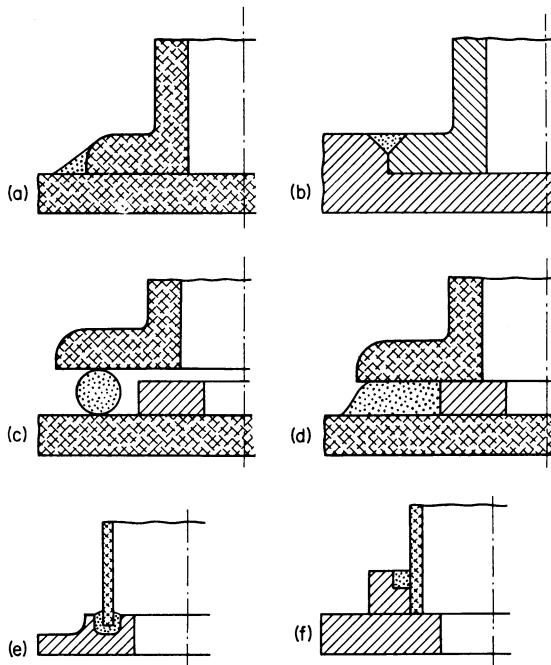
Waxed seals between flanges, pipes and plates: (a) outside seal; (b) interval seal; (c) spacer seal before sealing; (d) spacer seal after sealing; (e, f) groove seals
